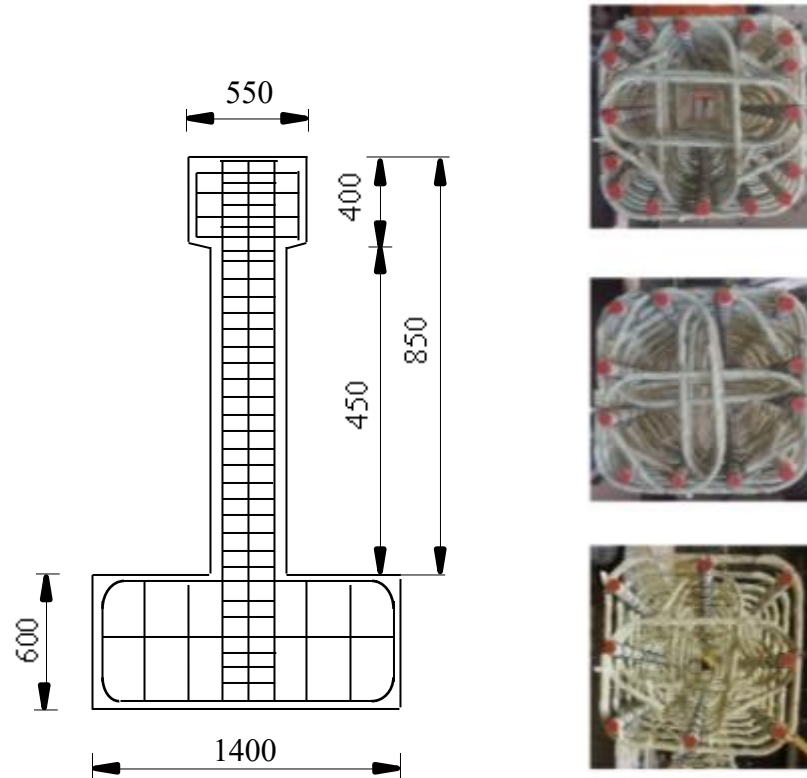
GFRP-reinforced square concrete column details (Ali and El-Salakawy 2016)
